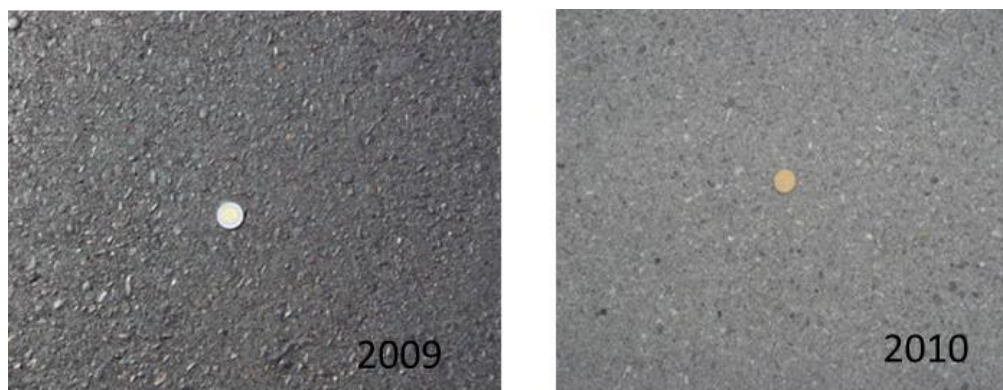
CPATT Test Track Pavement Surface Characteristics [UL-Islam 2010]
